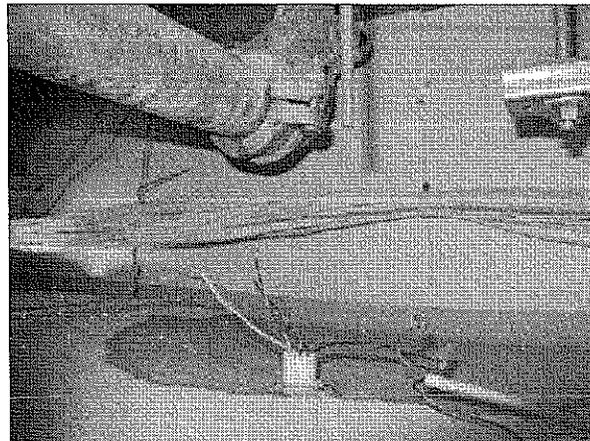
Leak reported by staff in staff training room appears to be either a plumbing leak from the fire sprinkler pipe or coming from above it
